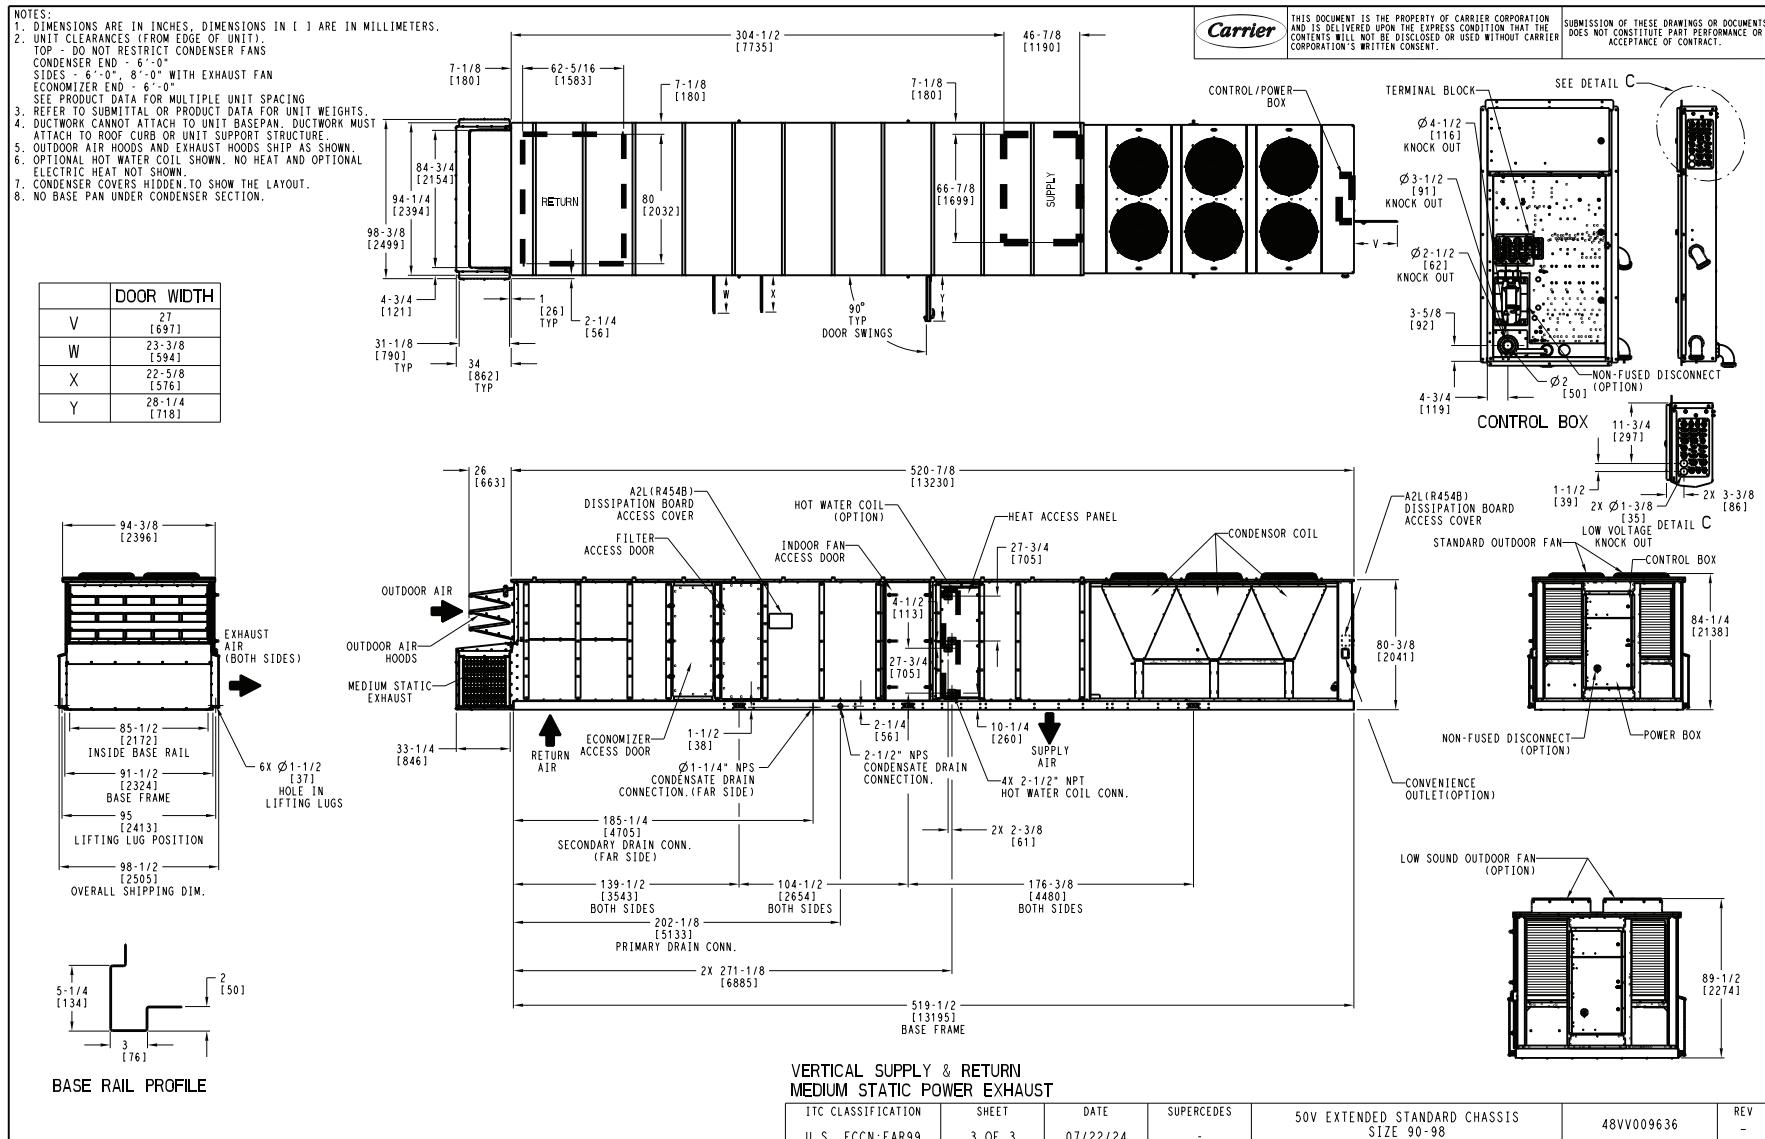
50V 90-100 Ton Extended Standard Chassis (cont)
